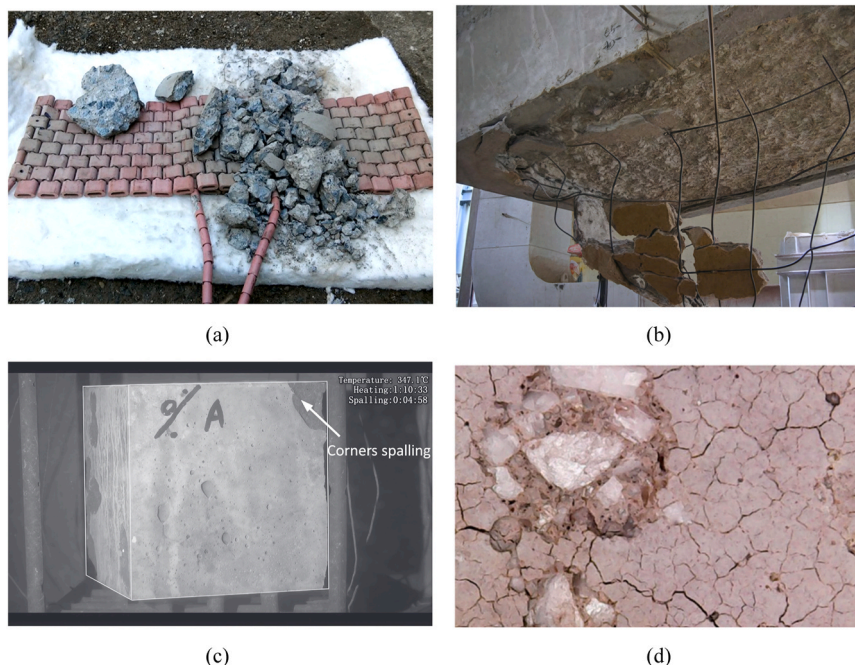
Types of spalling: (a) Explosive [4]; (b) Surface [5]; (c) Corner [6]; (d) Aggregate [7].
